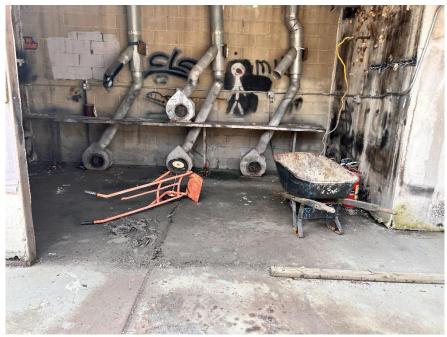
Former mechanical repair room in 725 Clinton Street (facing south).
